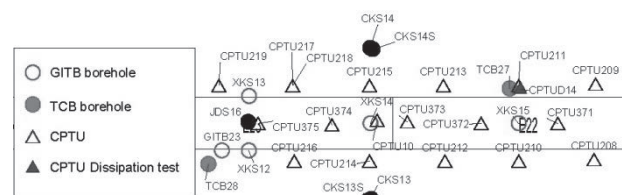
Typical arrangement of investigations along immersed tunnel alignment.
